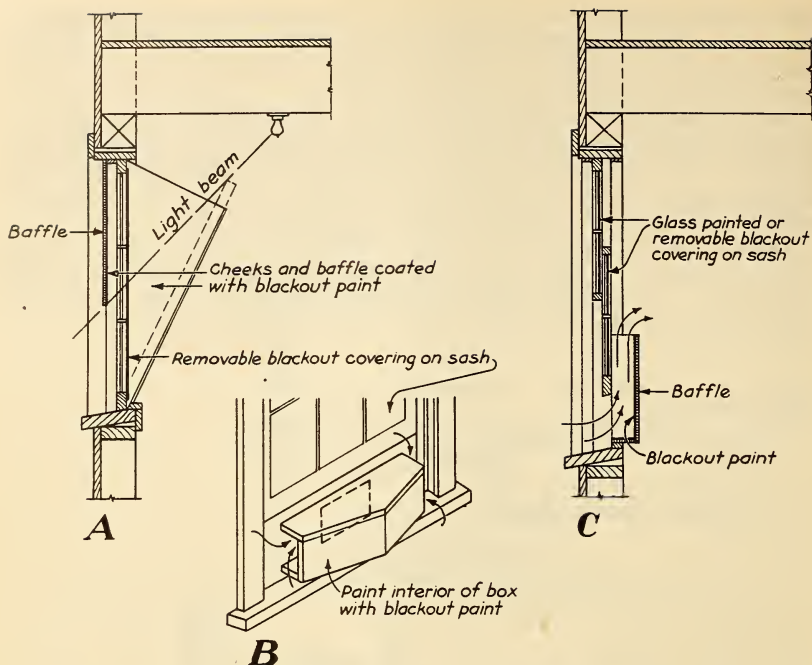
Suggestions for blacking out windows in dairy barns. A, For tilt-in windows; B, for double-hung sash; C, removable ventilating light lock.
